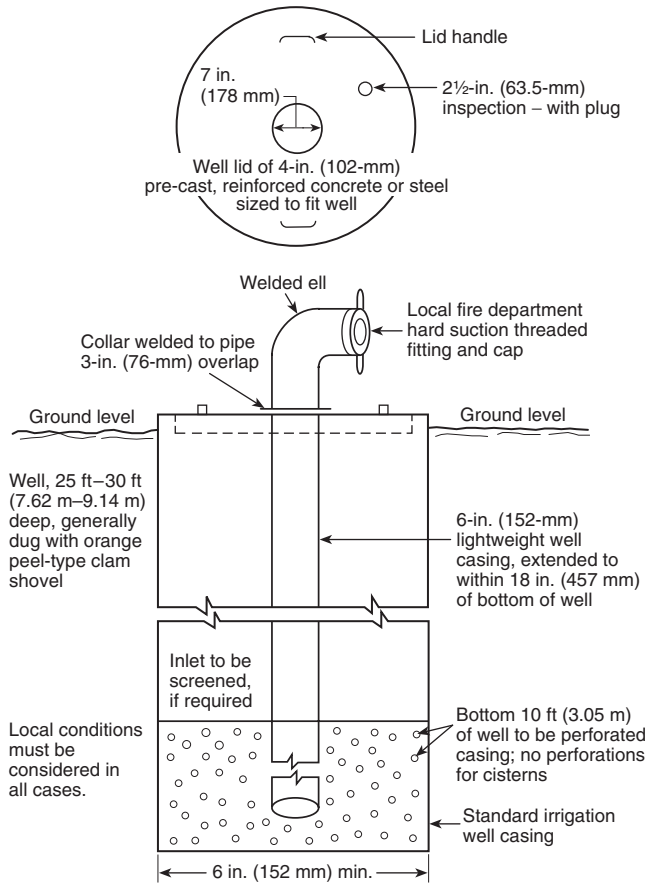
(h) Typical well (cistern) with dry hydrant installed. (For calculating usable water depth, see B-4.12.) (Courtesy of New Boston Fire Department, New Boston, NH)
